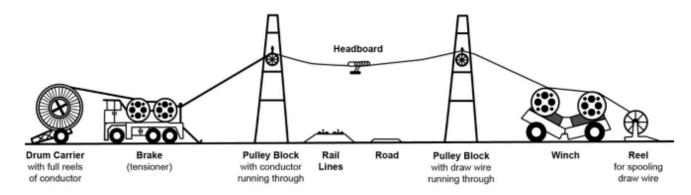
Diagram of typical transmission line stringing over roads or railway lines with brake and winch equipment
